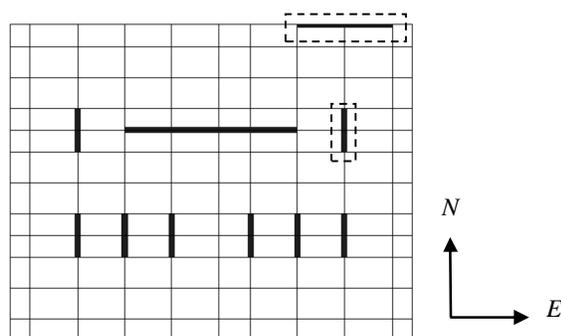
Plan rendering of the EBF configuration for 1st and 2nd stories. Dashed boxed frames comprise the EBF configuration for 3rd story.
